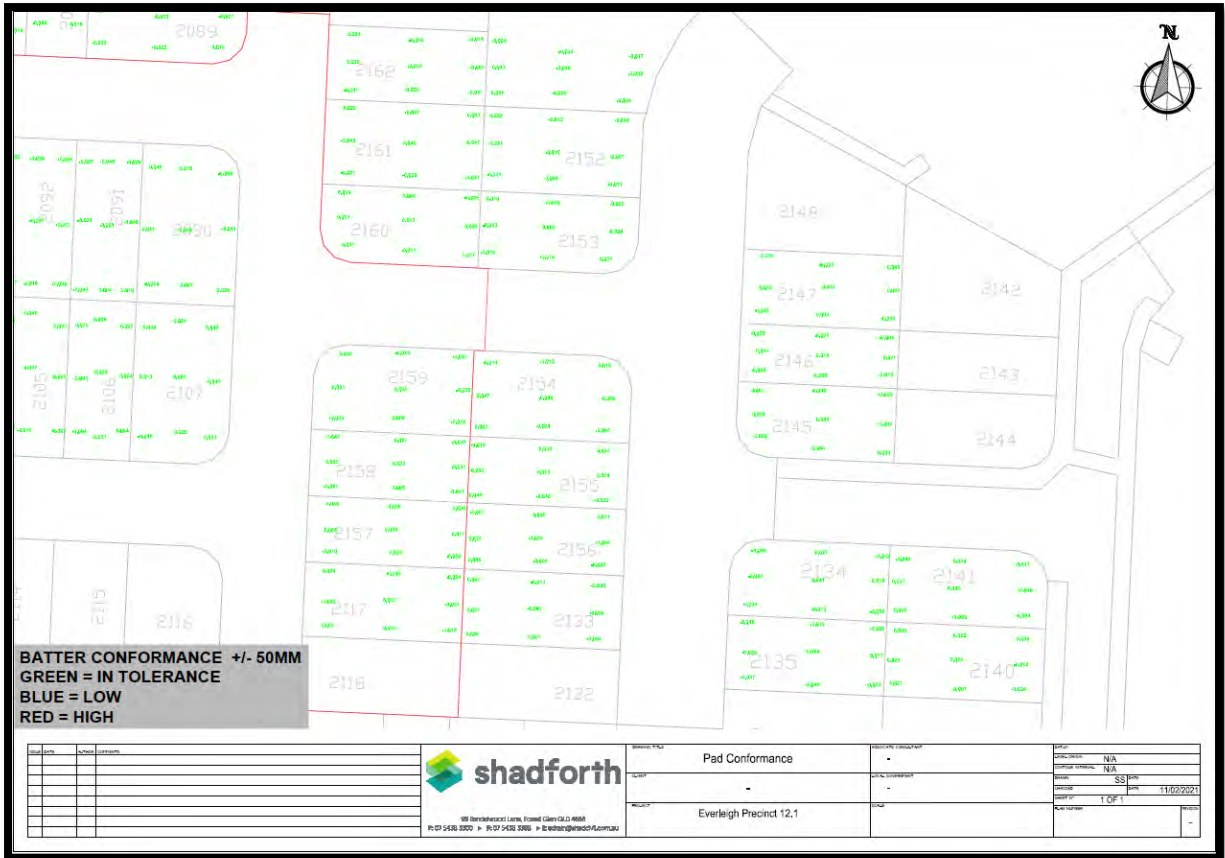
Actual Constructed Area of Fill – Shadforth’s Civil Survey Plan
